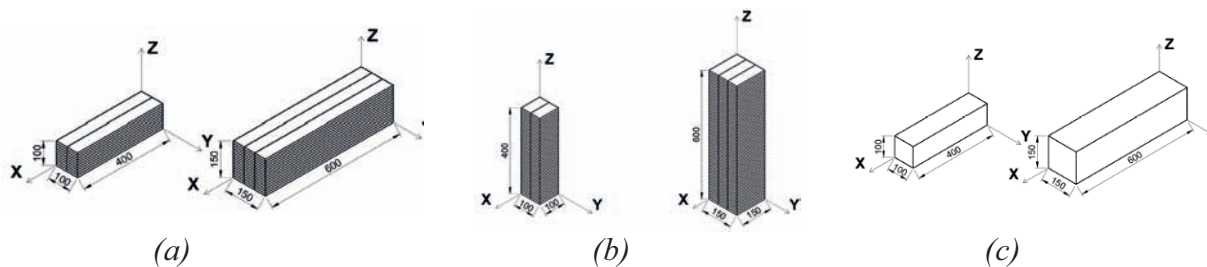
Geometric dimensions of concrete fragments for determining the tensile strength of concrete ( $R_{bt}$ ), made fragments by layer-by-layer horizontal extrusion of concrete: a) - specimens for flexural tensile tests under loading perpendicular to the layers of the seal; b) - specimens for flexural tensile tests under loading parallel to the layers of the seal; c - control specimens made by traditional technology
